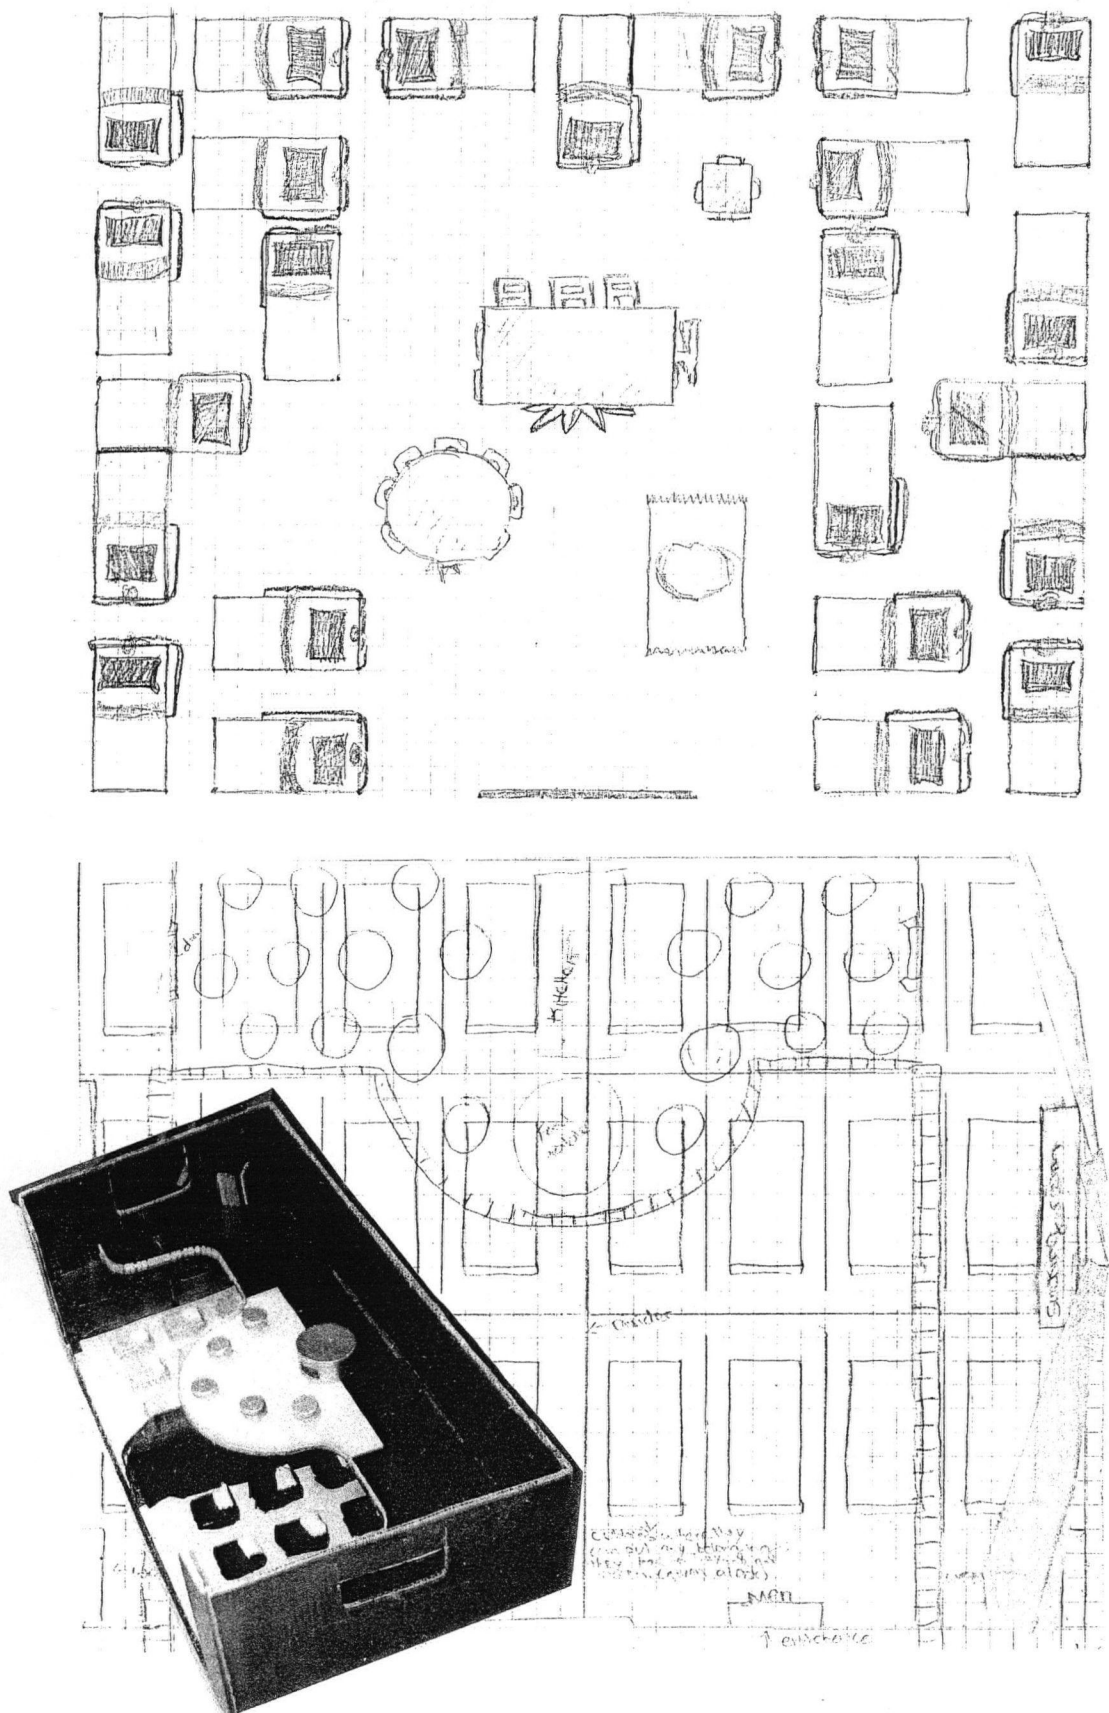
Plans and a model for a shelter - students experimented with stacking beds to provide space for amenities, and one student used tracing paper to consider a mezzanine.
